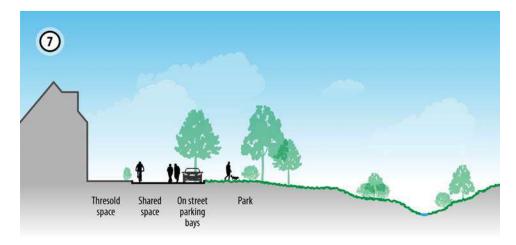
Indicative Street Section 7: Tertiary Street overlooking park.
